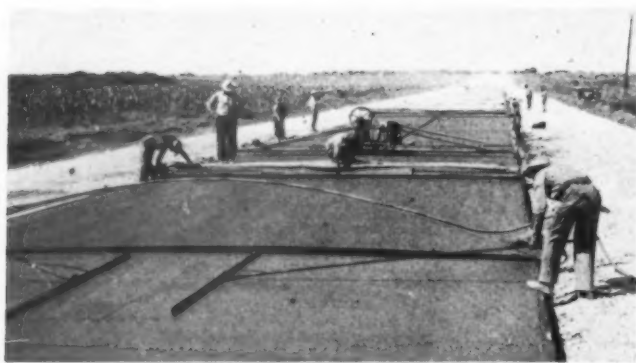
Hand Finishing of Surface Joints and Edges. Note Center Stripe Machine in Background
